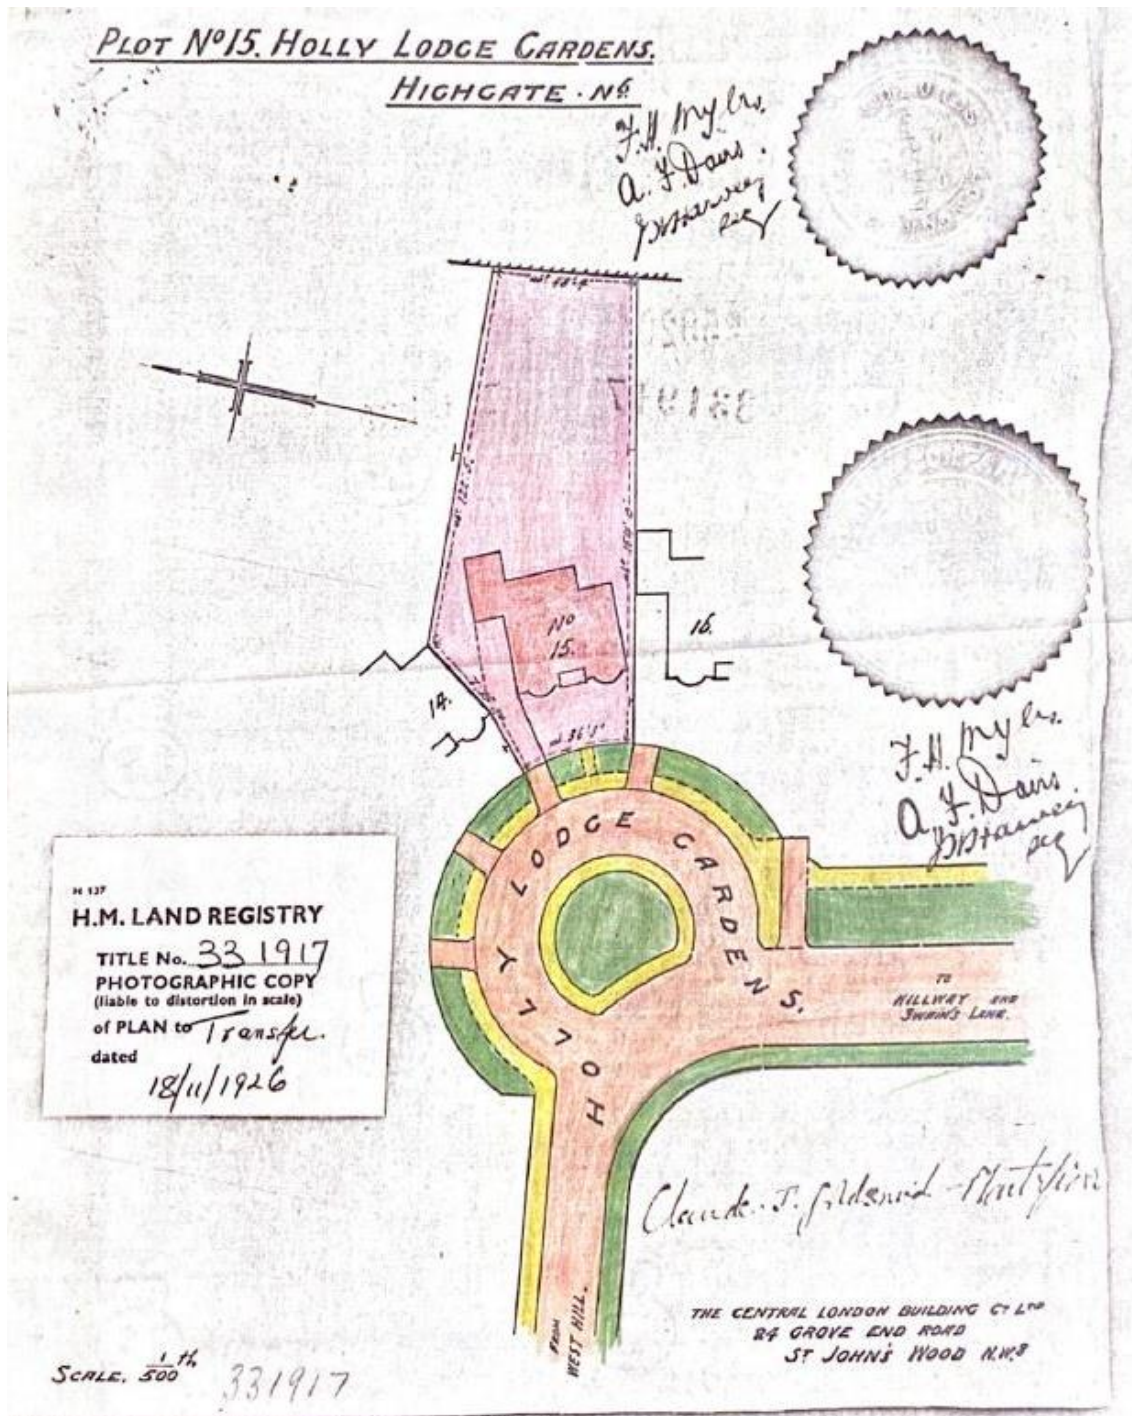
Title plan dated 18 November 1926 showing the attached garage to the NE corner of the house and the stepped arrangement of the rear elevation of the house. The same arrangement can be seen at the rears of the neighbouring houses to either side.
